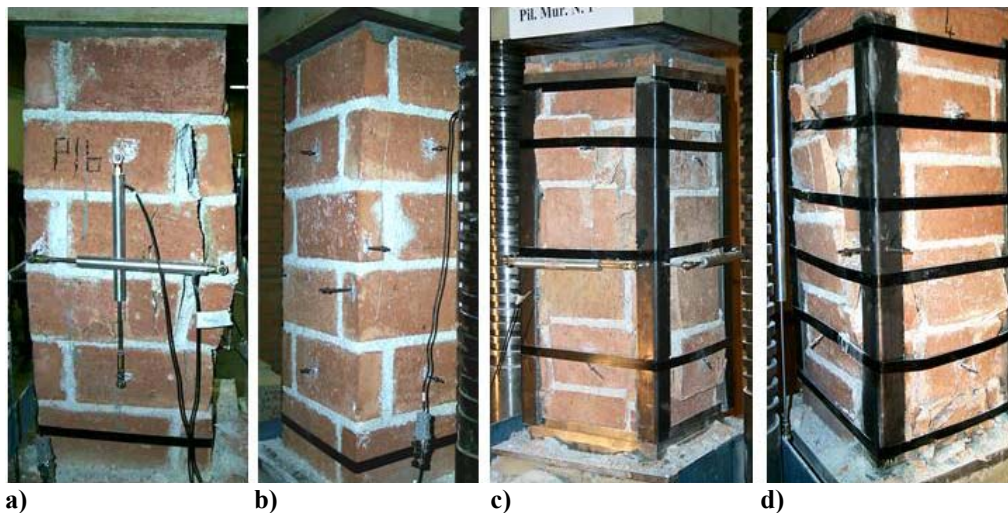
Column specimens under tests: a) typical failure mechanism of unstrengthened specimens due to brick layer instability, b) failure of column 1 before strengthening, c) failure of column 1 after strengthening, d) failure of column 6.
